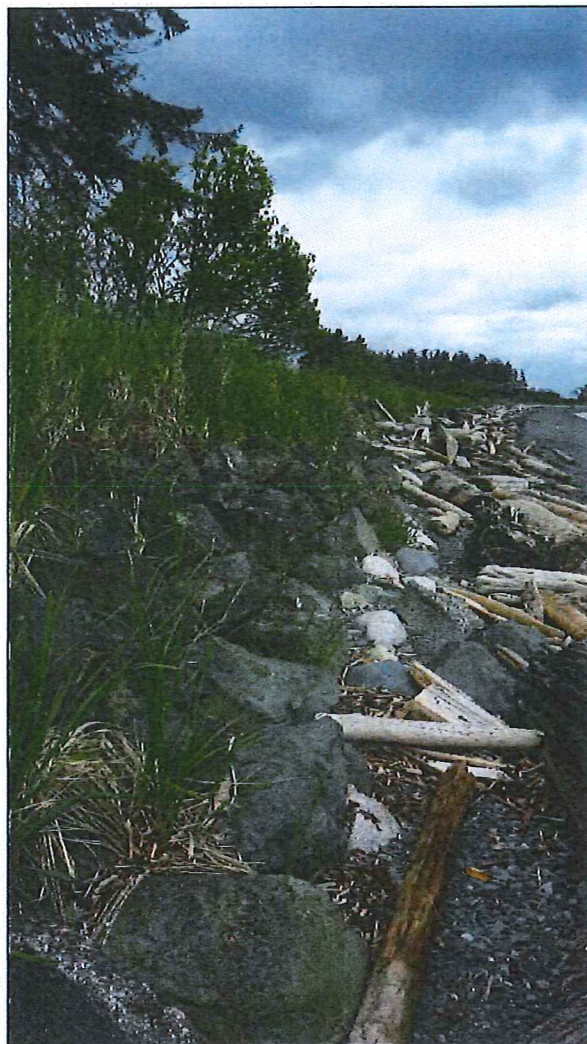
Showing the shoreline facing north towards Piper's Lagoon Park with rock rip rap shoreline protection.
